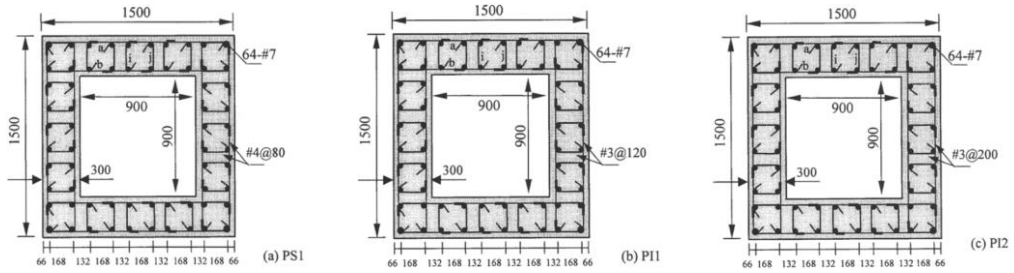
Details of the cross section, Yeh et al. (2002)
